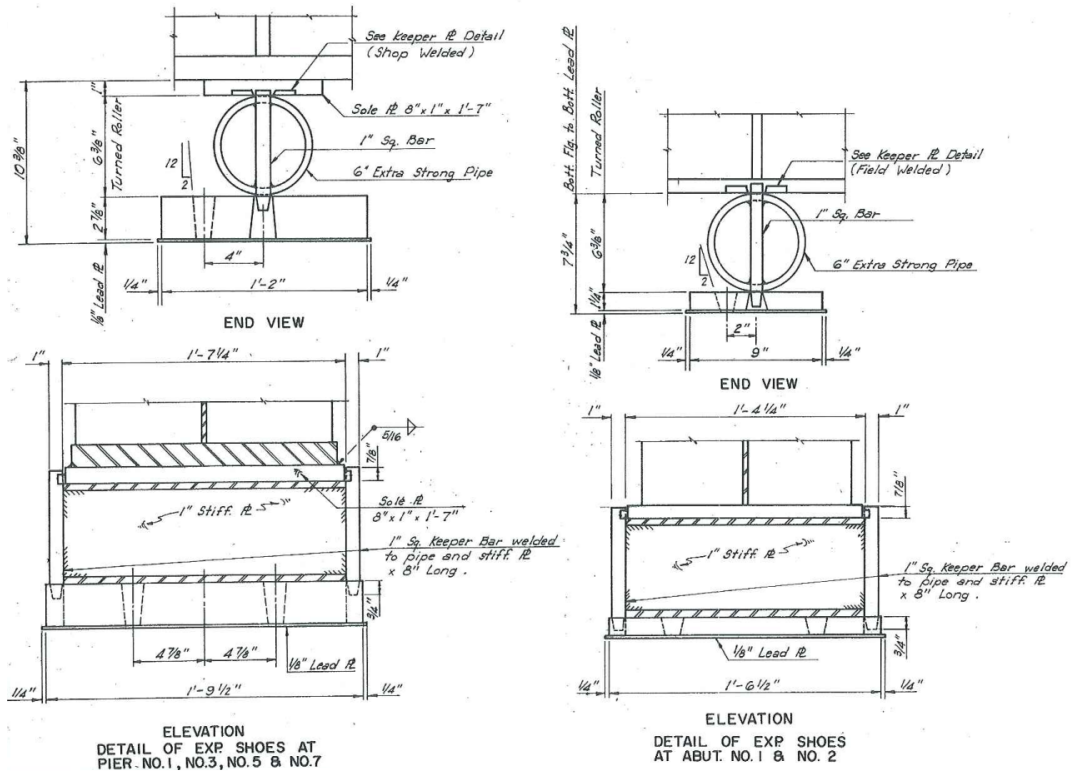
Roller bearing details. Taken from Proj. No. I-FI-35-4(97)166 plans.
